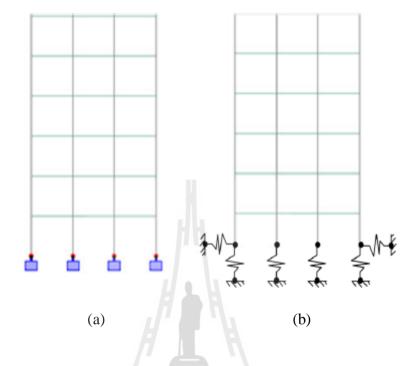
The model of considered structure with (a) fixed base; (b) flexible base (Chandrasakha, 2013)
